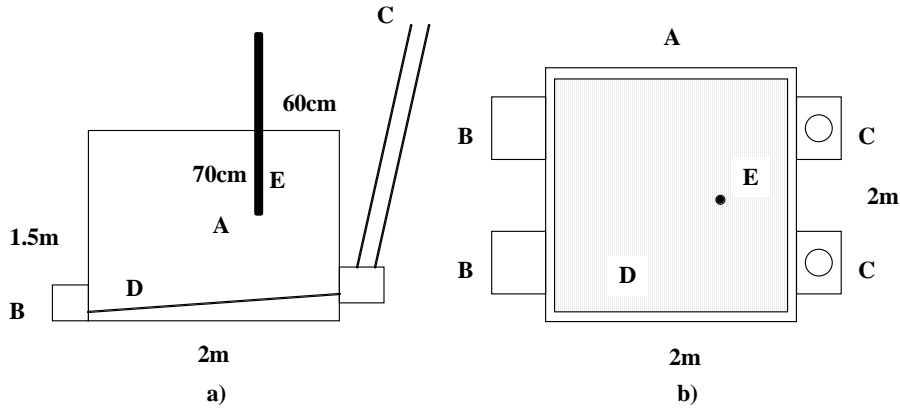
Plan of Vietnamese kiln a)section, b)view from the top
